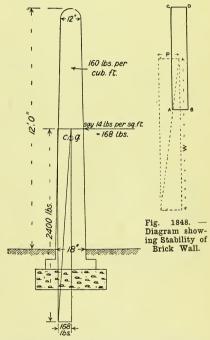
Diagram showing Stability of Masonry Wall.
